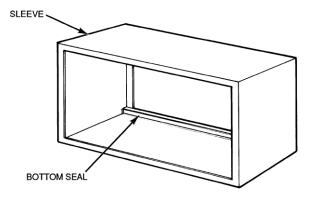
Remove Bottom Seal From GE Plastic Sleeve
